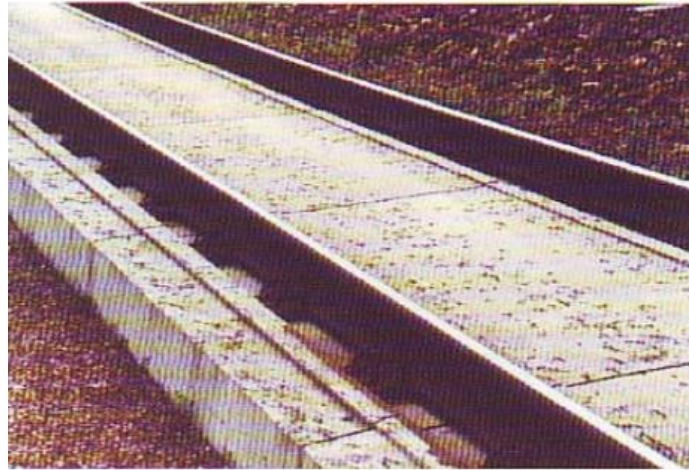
An example of a monolithic slab track design with direct rail fastenings (Esveld, Modern Railway Track 2nd Edition, 2001)
